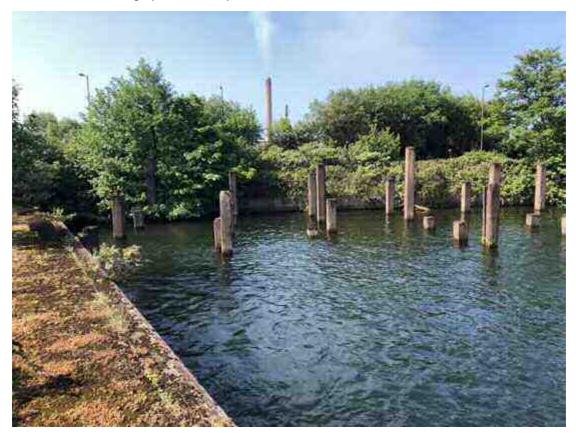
View from southern site area, facing south-west towards existing cofferdam and remaining stone columns.
